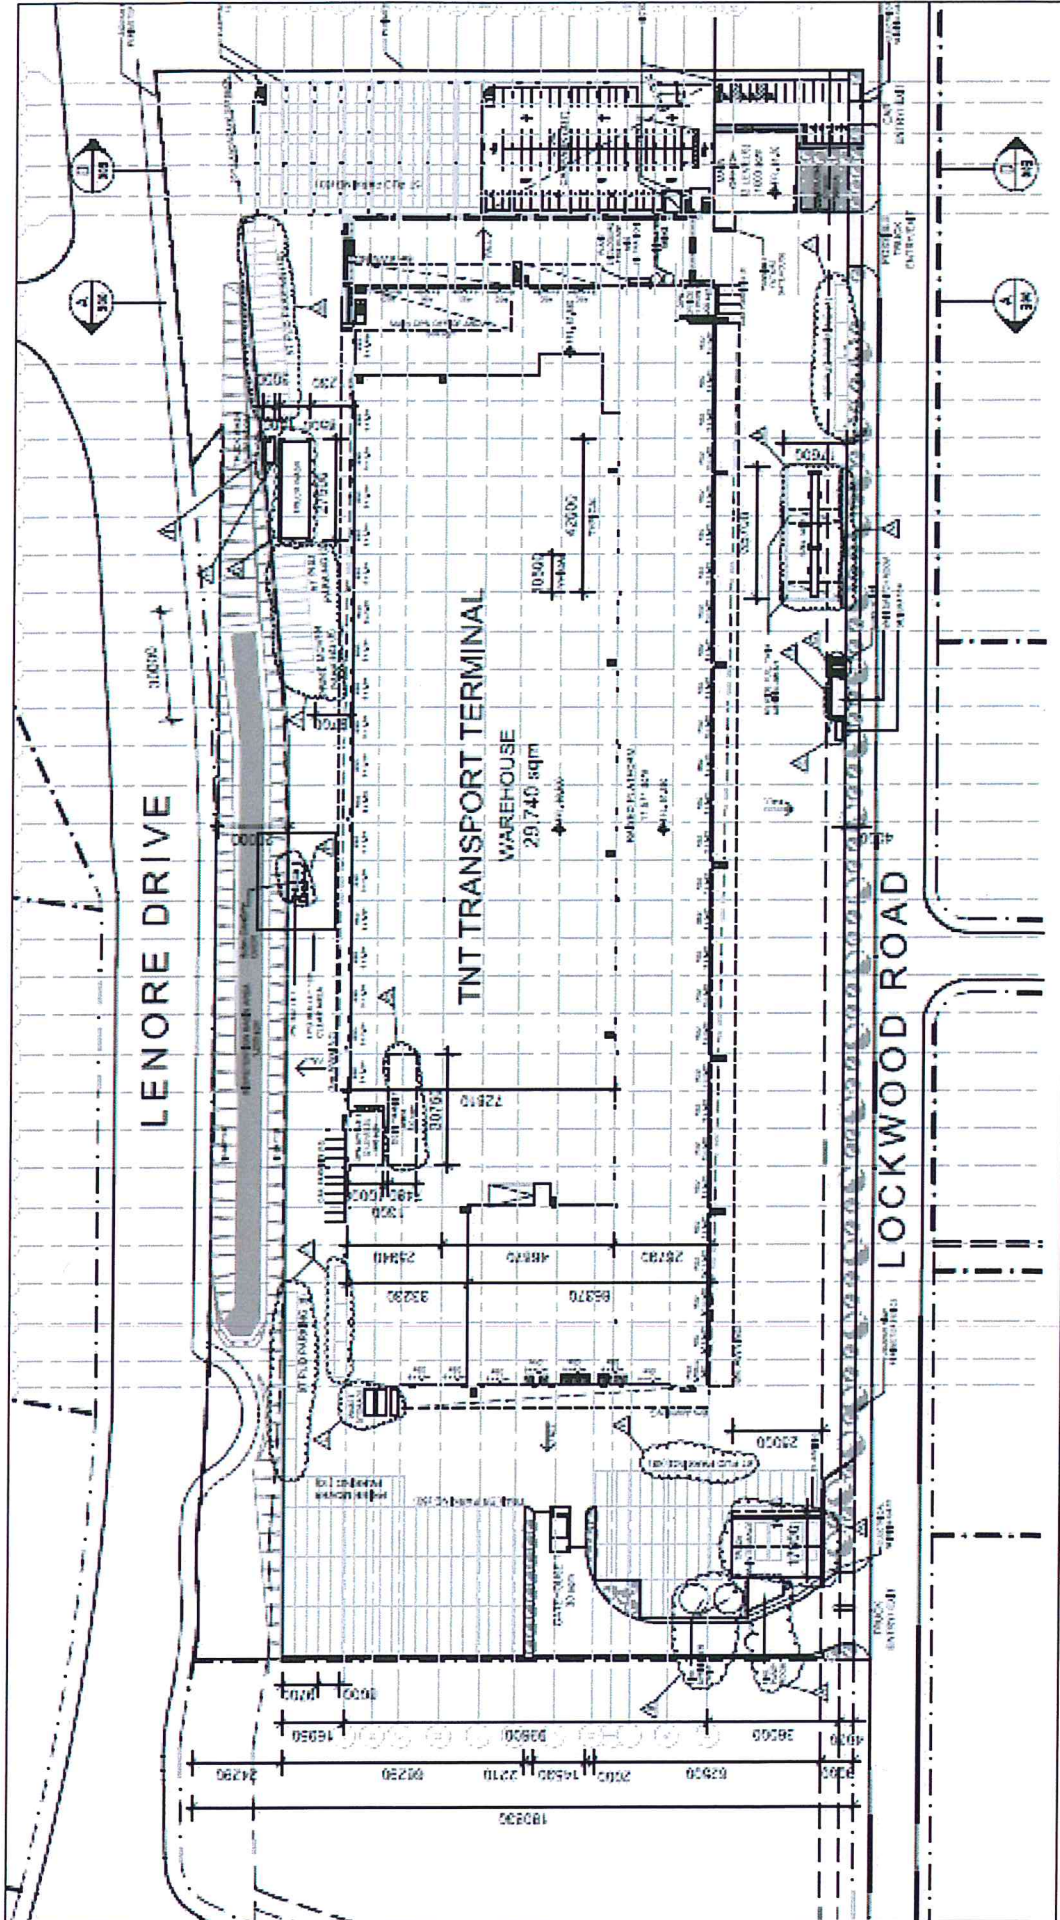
Proposed Site Layout (Plan No. S96-002-E) (Amended by SSD 6040 MOD 2)
